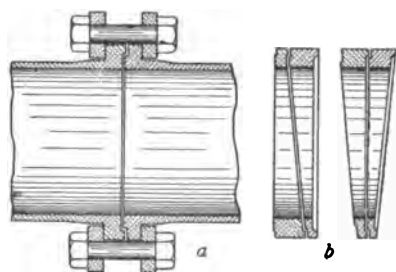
Detail of Joint Connections for Pipe-Line of Water-Power Plant at Vauvry, Switzerland.
